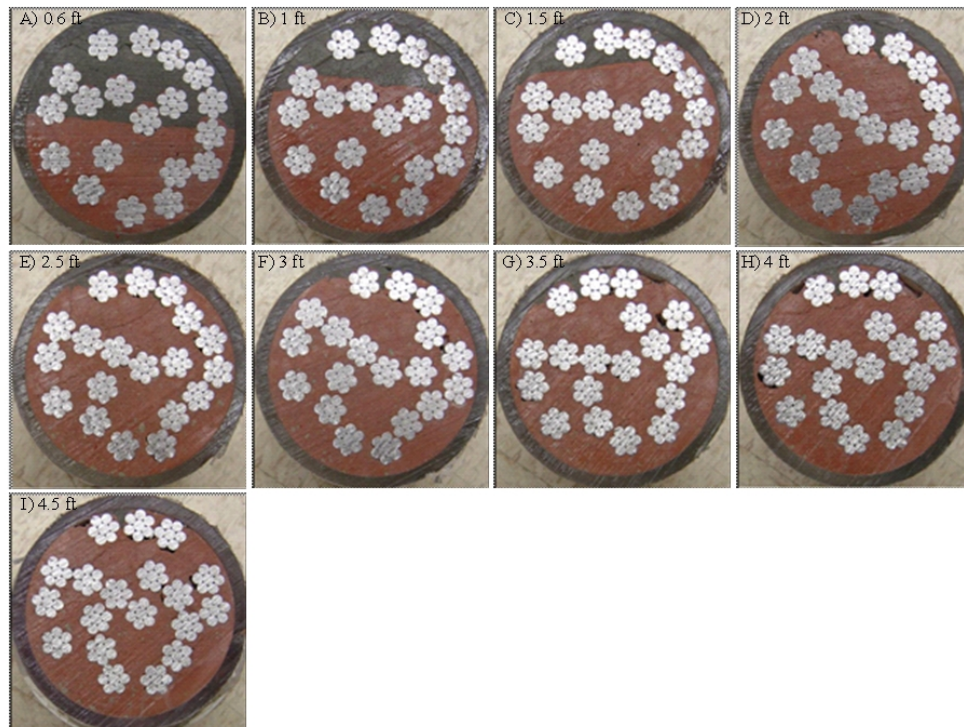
Cut Sections of Specimen VG-C3-1 for the Filling Analysis of Repair Grout.
